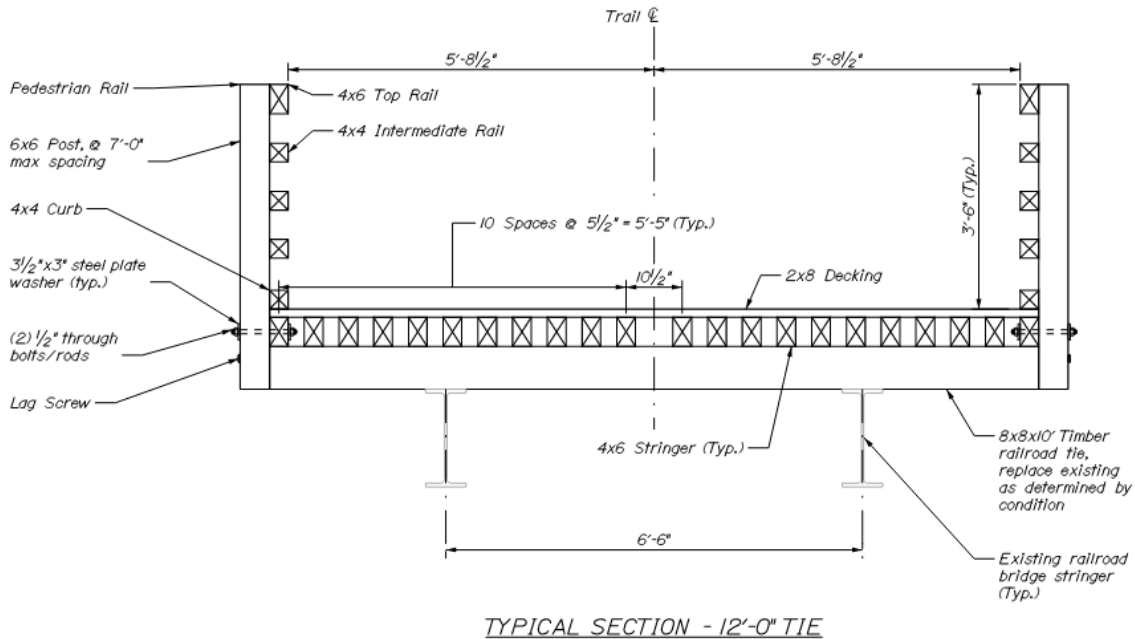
Proposed Bridge Typical Section 12'-0" Tie
